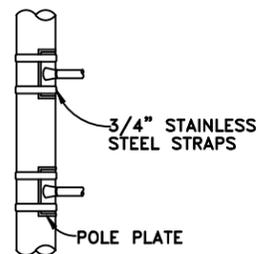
DETAIL OF MAST ARM MOUNTING FOR DOGHOUSE SIGNAL HEAD (5-SECTION)
